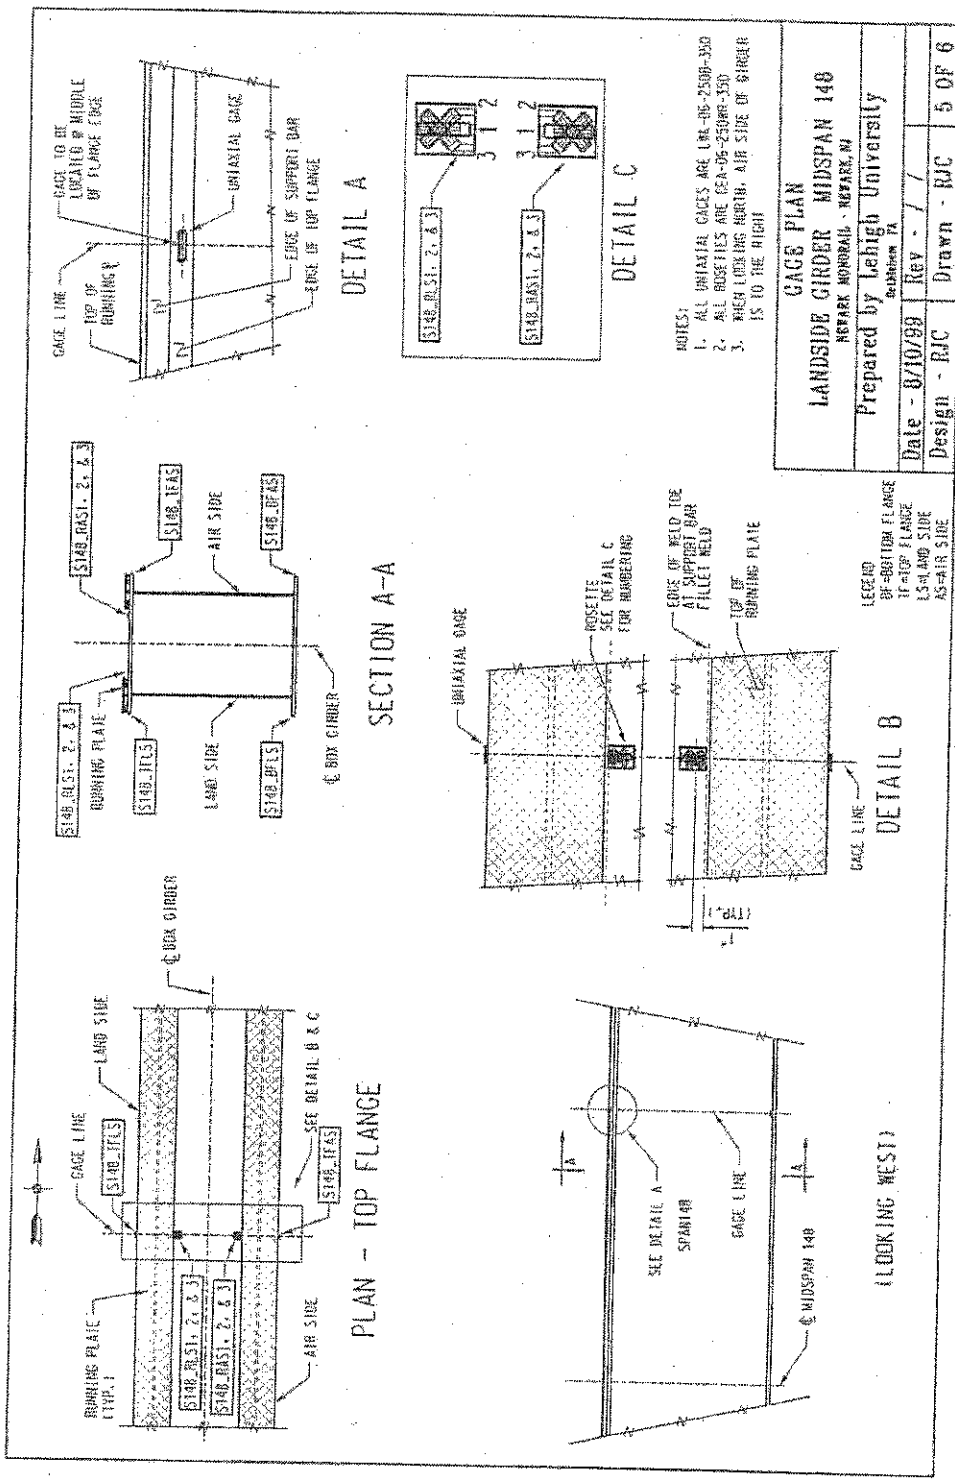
Strain Gage Layout at Midspan Span 148 – Land Side
